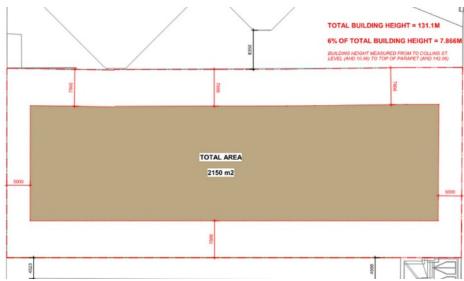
DDO10 maximum floorplate - (Source: Cox Architecture)
